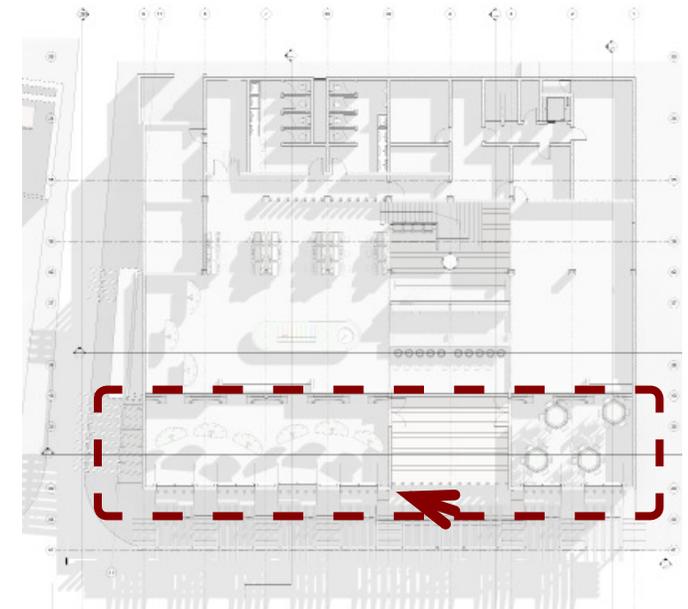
First floor street interaction Screening elements exist on horizontal and vertical planes.
